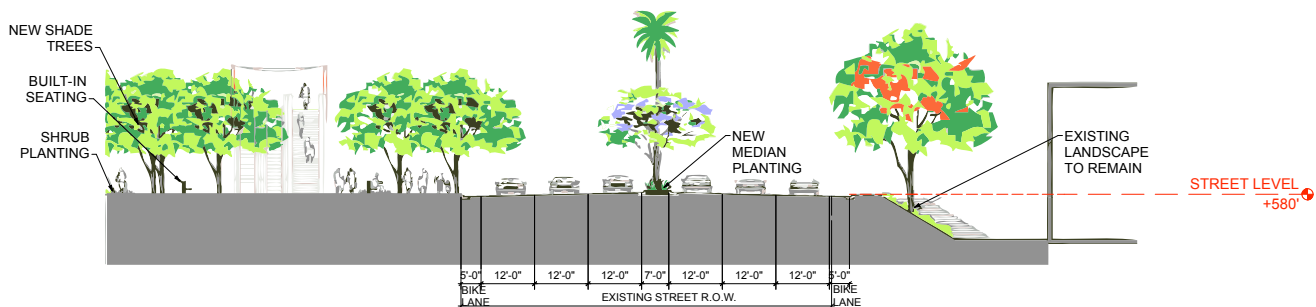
Conceptual section of Universal Hollywood Drive reconfiguration near Lankershim
